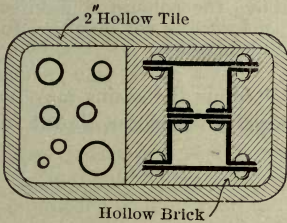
Brick and Terra-Cotta Column and Pipe Chase, Monadnock Building, Chicago.
